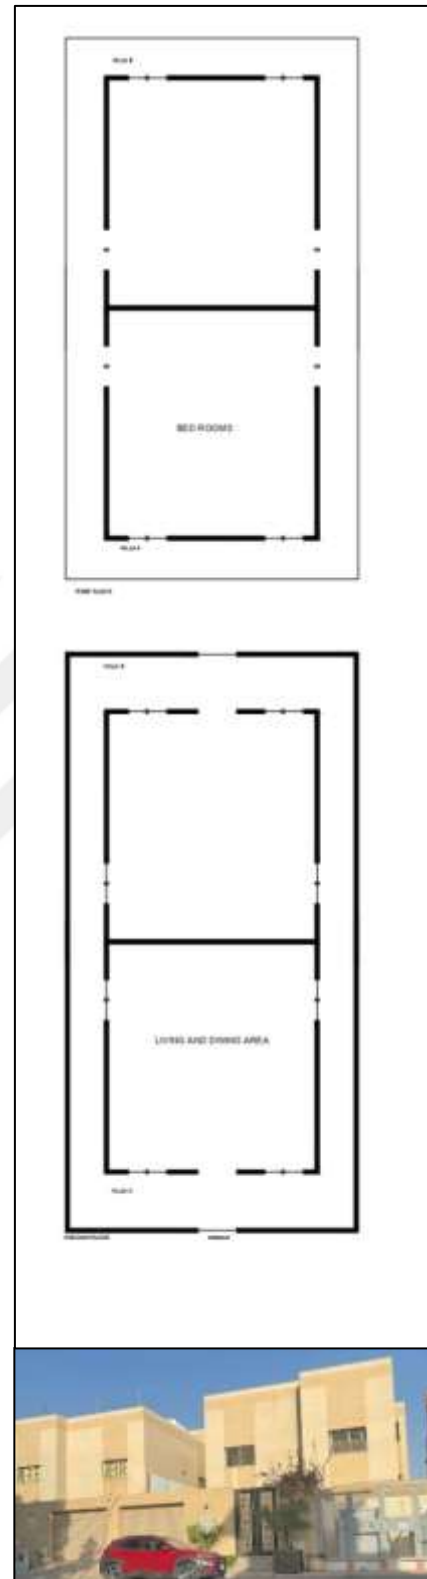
Villa House Plans and Elevation of Attached on Two Sides Type by the Author.
